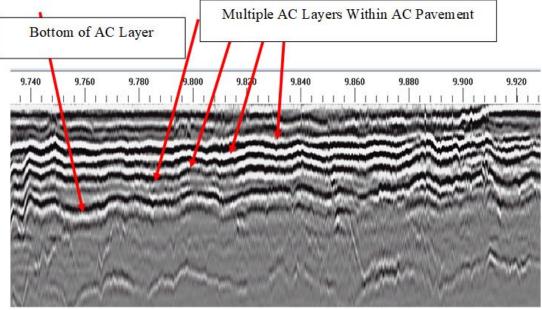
GPR Showing Possible Multiple AC Sublayers Within Asphalt or AC Pavement. GPR = ground penetrating radar; AC = asphalt concrete.
